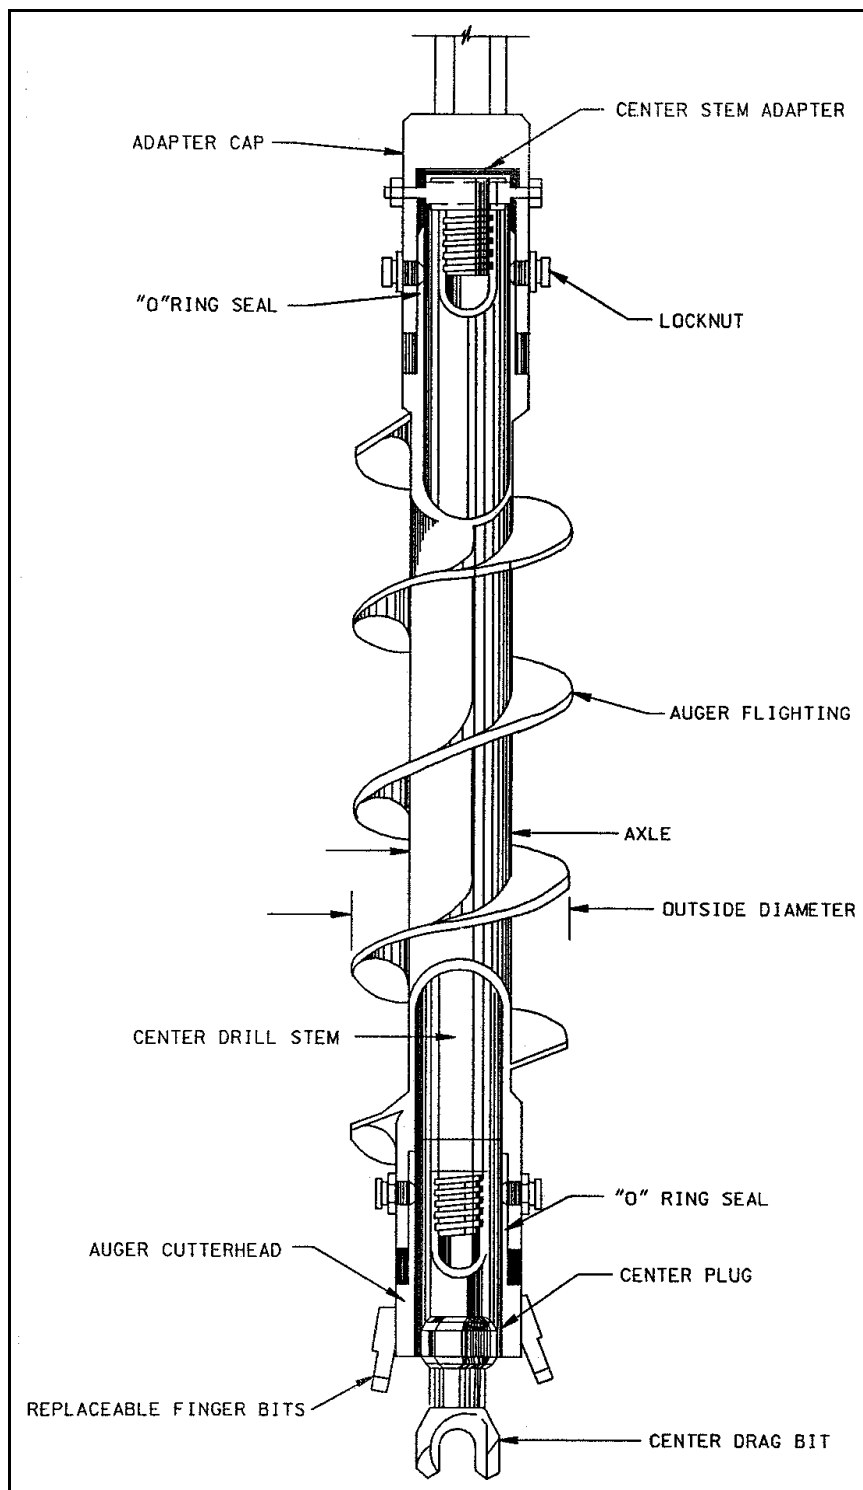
Isometric drawing of the hollow-stem auger with the center drag bit which can be used with soil sampling devices (after Acker 1974)
